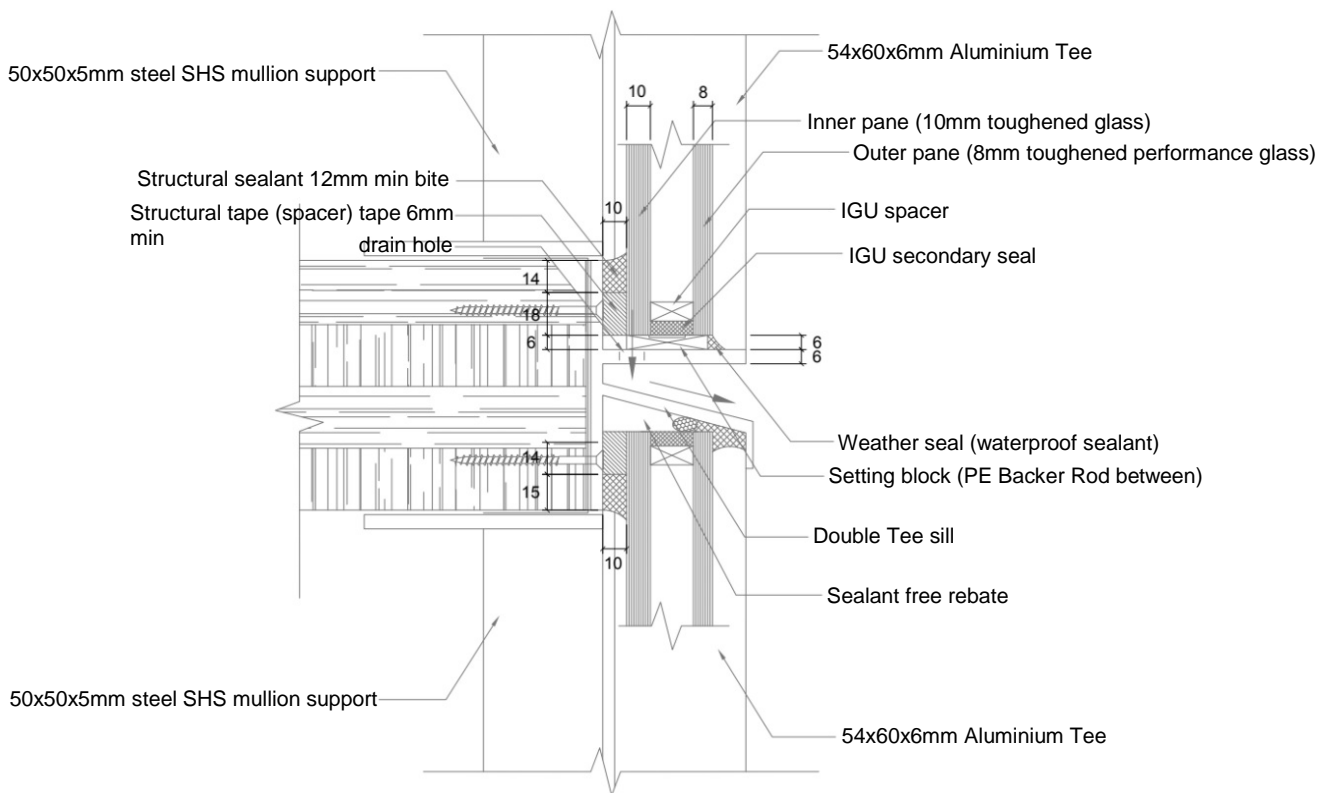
Typical sill detail of the modified fixed glazing system (not to scale)
